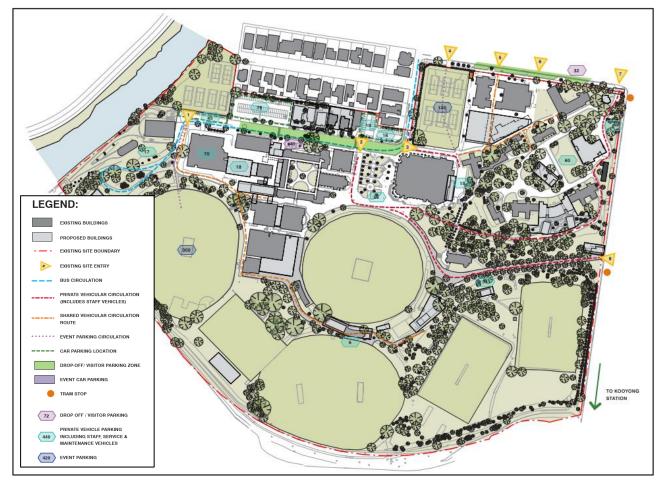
Scotch College Development Plan (Parking, Access and Circulation)
